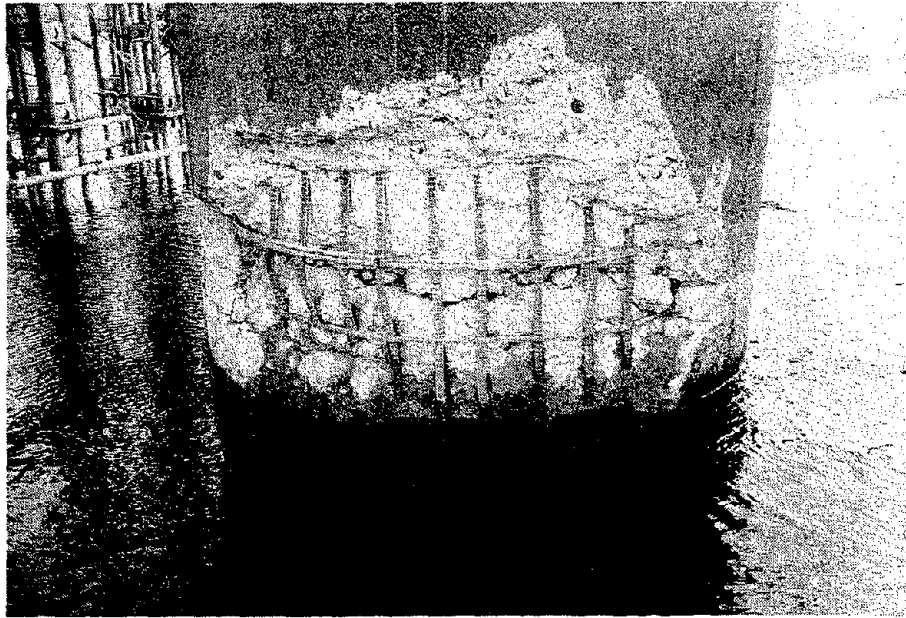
Damage of Shin-shiriuchi Bridge at The First Termination Point (Old P3)
